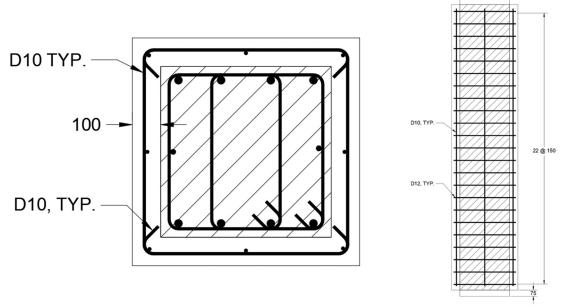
Typical cross section and elevation view of RC Jacket retrofit for Munro building
